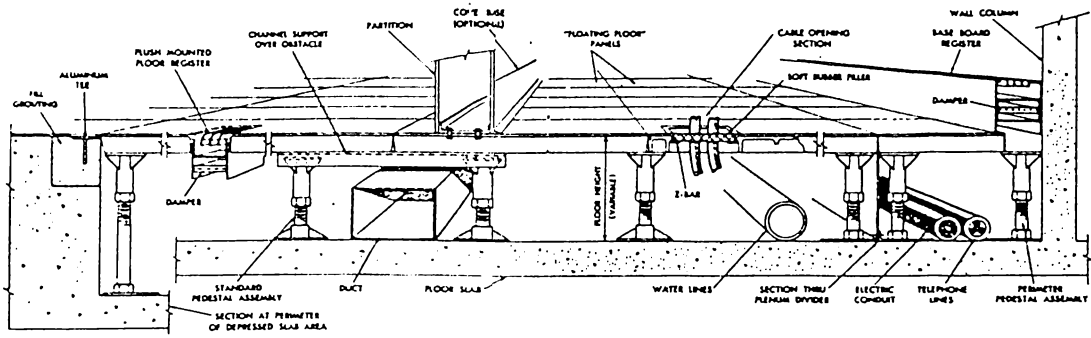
Details of a Raised Floor System (Pile, 1978)
